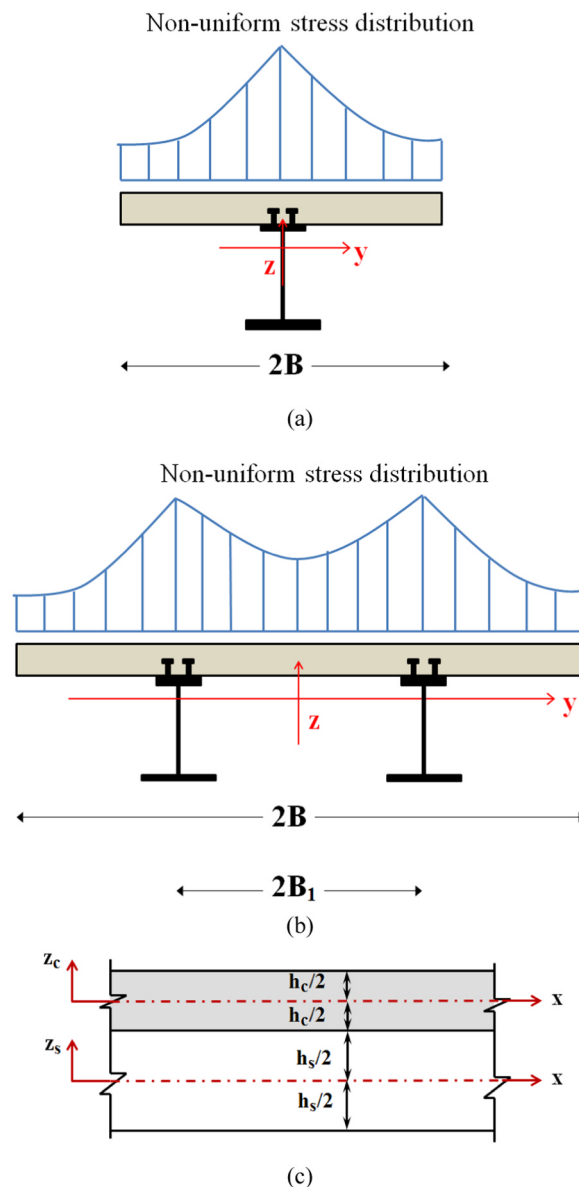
Typical geometry of composite structures: (a) steel-concrete beam cross-section, (b) twin-girder deck cross-section, (c) side view of a portion of the composite structure.
